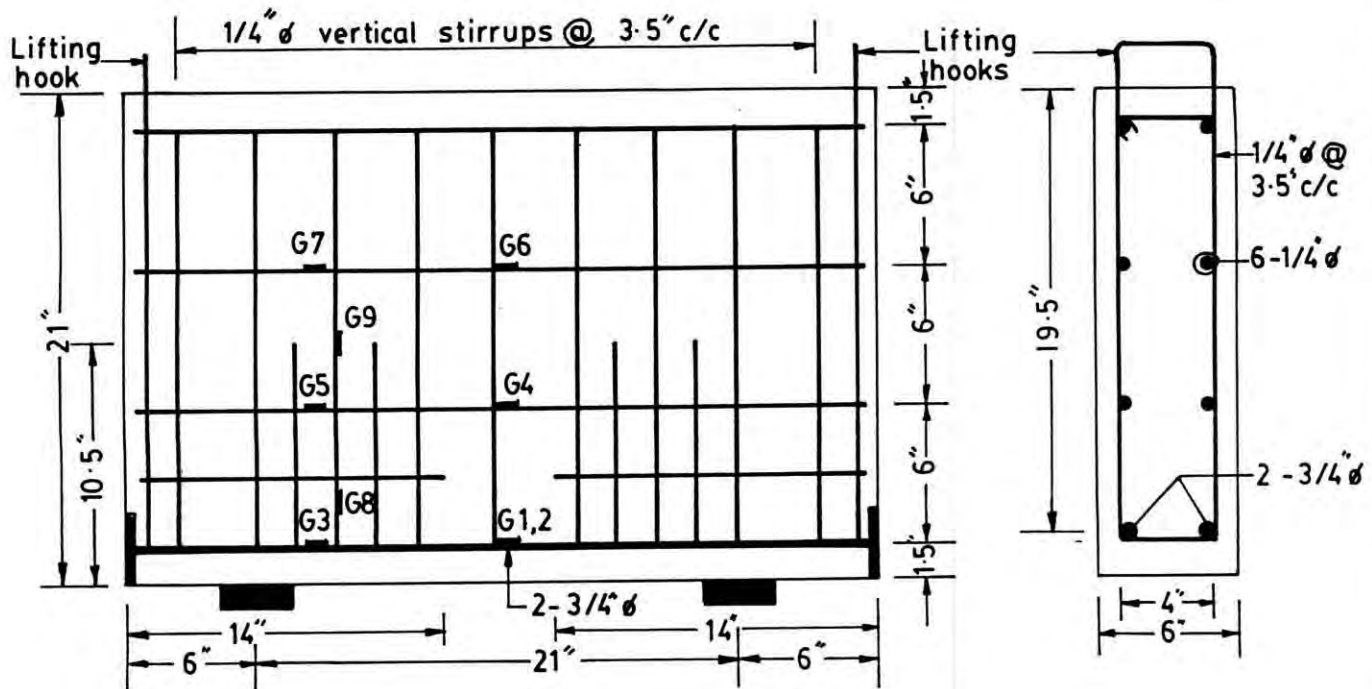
Reinforcement arrangement of beam DB-P7
